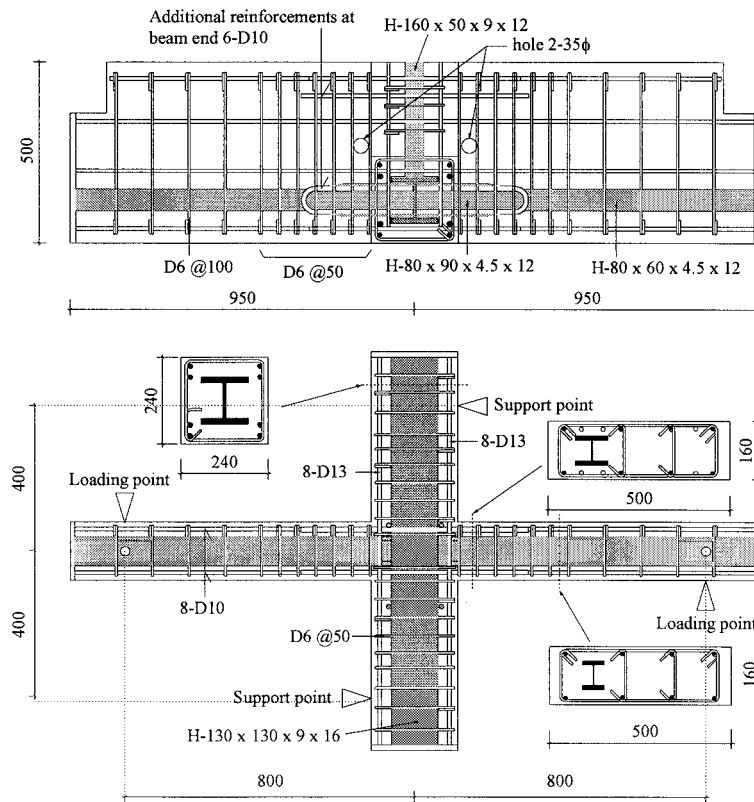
Detail of No.3 [SRC Cross-Shape Joint]
